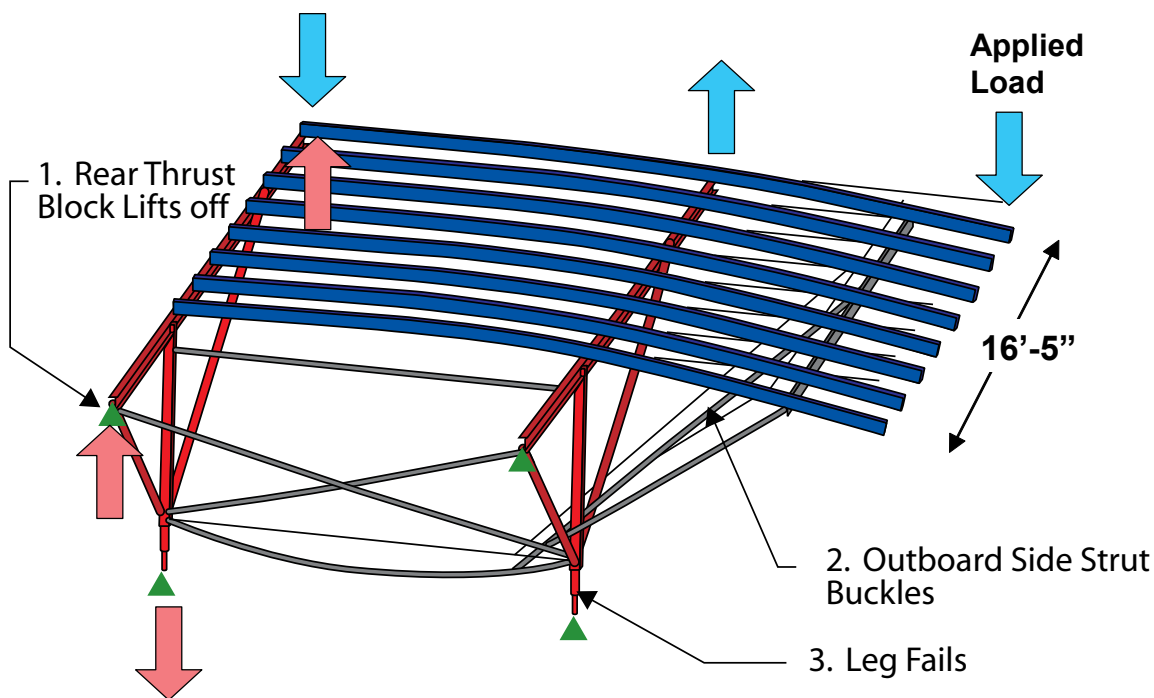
This figure shows the failure mechanism of the work platform. An applied load near the corner of the overhang caused the far outrigger frame to disengage and become unstable. The blue arrows indicate forces on the wood joist; the pink arrows indicate needed reactions on the outrigger frame.
